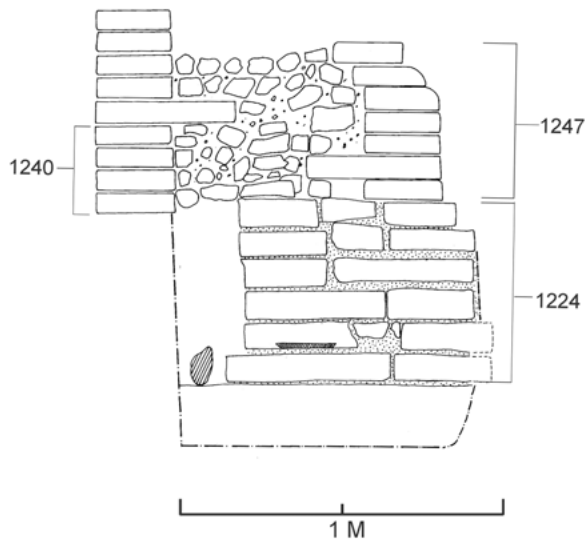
Cross-section of walls 1247 and 1224 South Temple.
